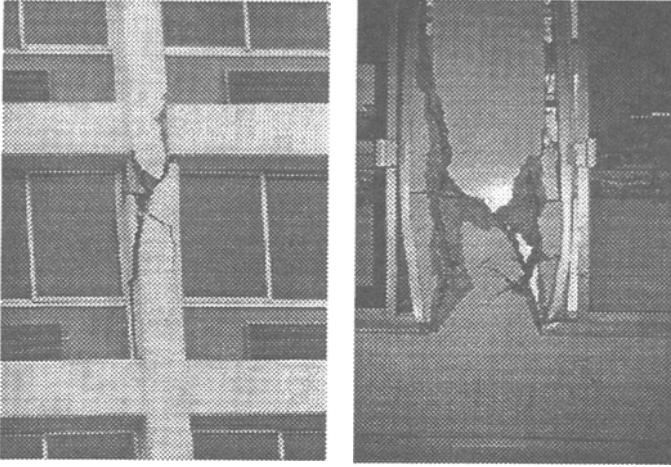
Shear failure of column at the fourth floor of the VAN NUYS 7 building (views of the same column from outside and inside).
